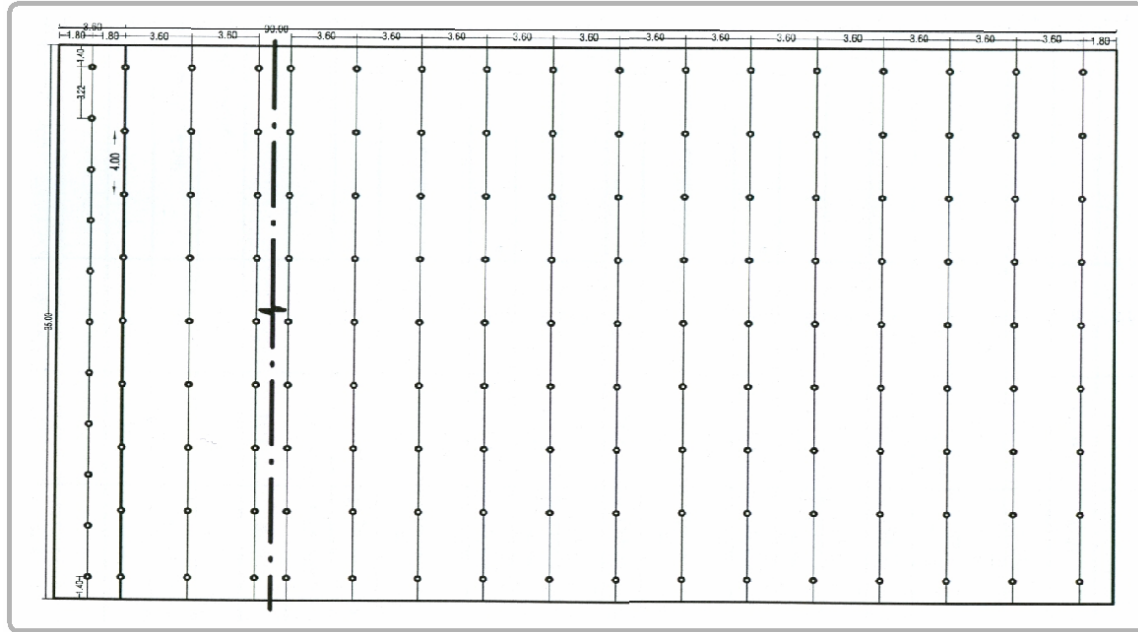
Al, B.(right): parallel drilling (horizontal longitudinal section), Thickness 35m and length of stope 90 m
